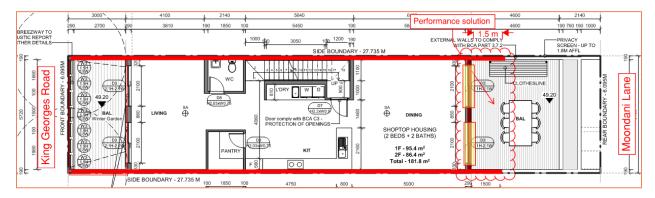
Indicative fire wall markup – First floor. Note: fire wall and fire rating markup may be indicative, and the building shall meet NCC DtS and certifier's requirements for fire rating in the DtS areas
